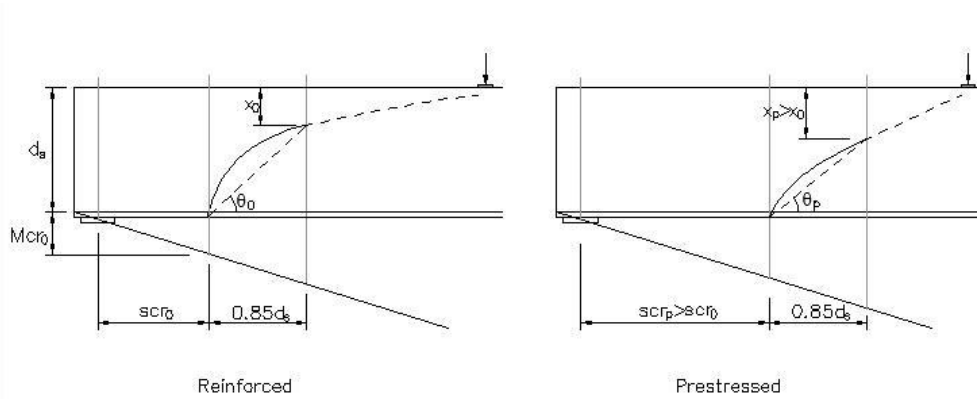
Position of the shear critical crack in reinforced and in prestressed concrete members.
